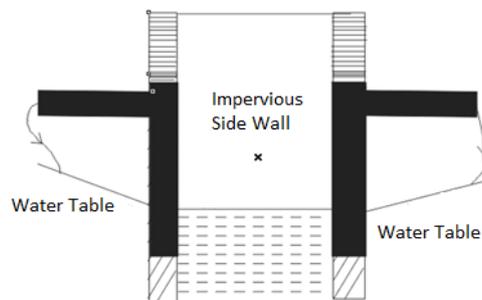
Impervious sidewall, platform and parapet wall attached to a well
